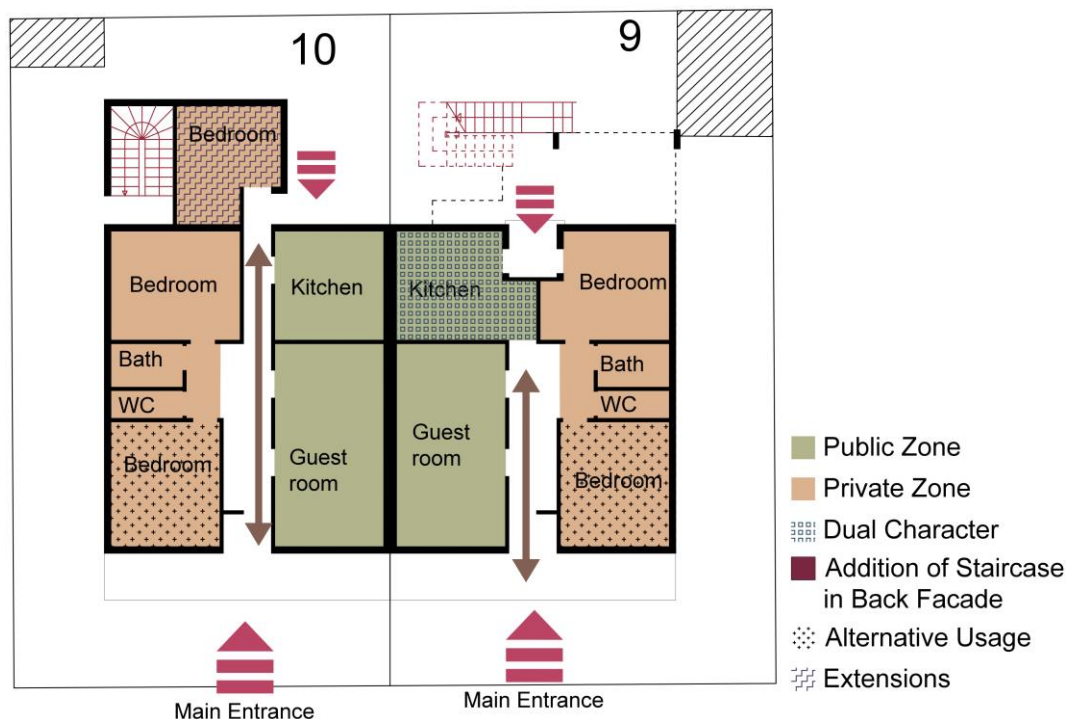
Ground floor sample of original building with the addition of staircase in back façade and leading type I with back façade staircase (Author, 2017)
